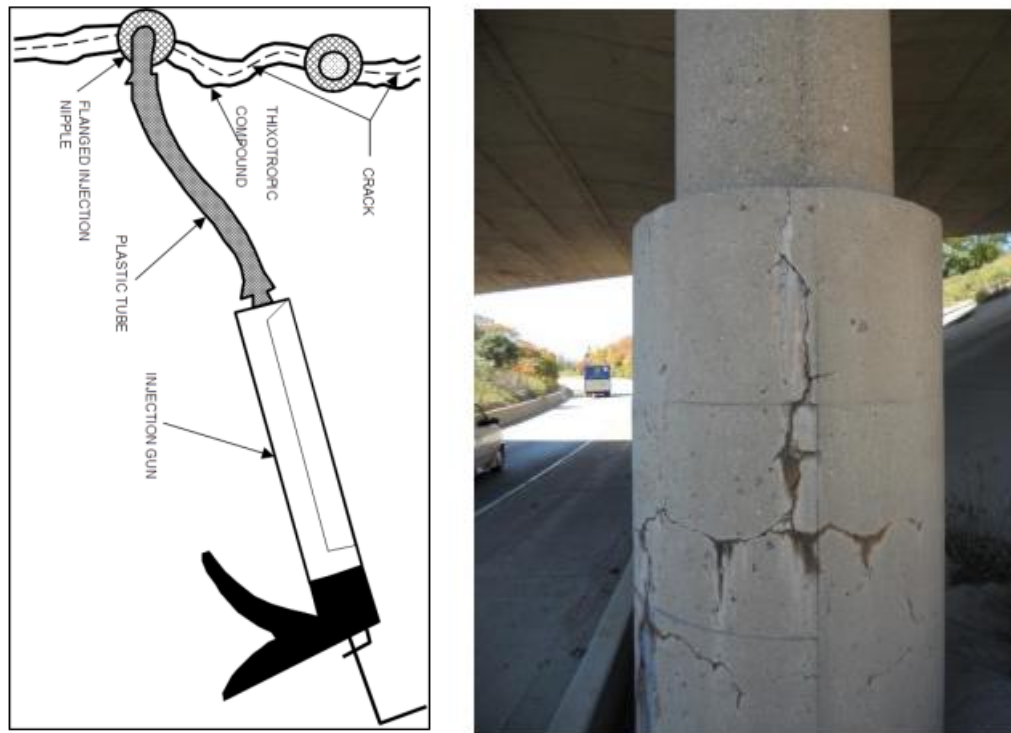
Concrete crack epoxy injection repair (Ainge, 2012)
